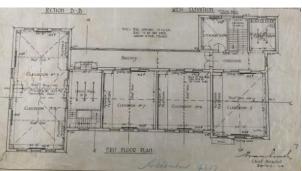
First floor plan, showing balcony connecting classrooms. (Source: Public Records Office of Victoria VPRS 3686-P7-2033)
